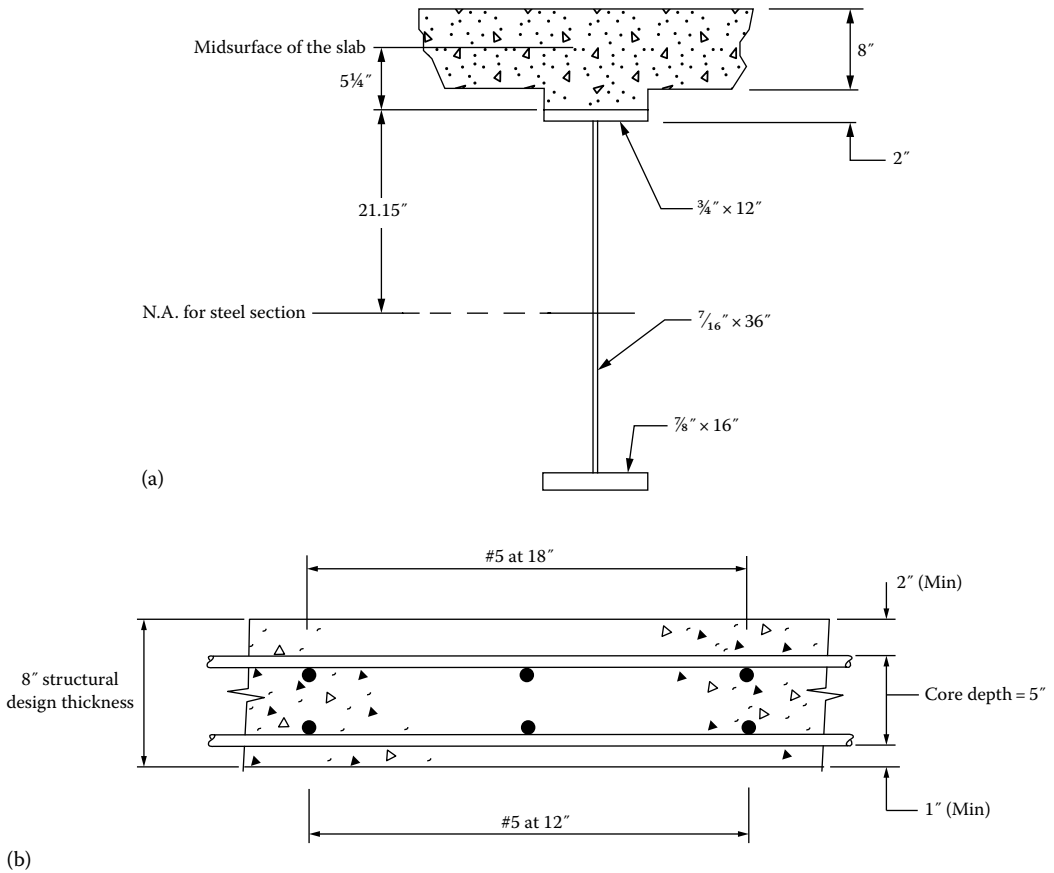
(a) Cross section of composite beam. (b) deck slab reinforcement details. (Courtesy of AISI.)
